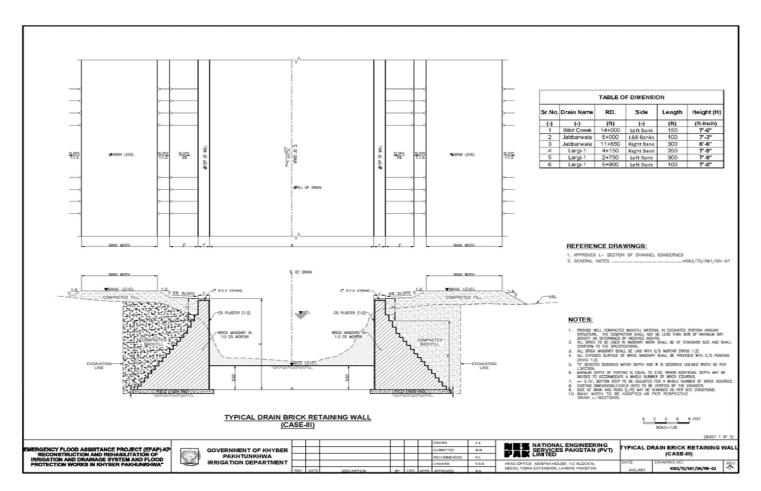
Typical Cross Section for Drain Bank Retaining Wall
